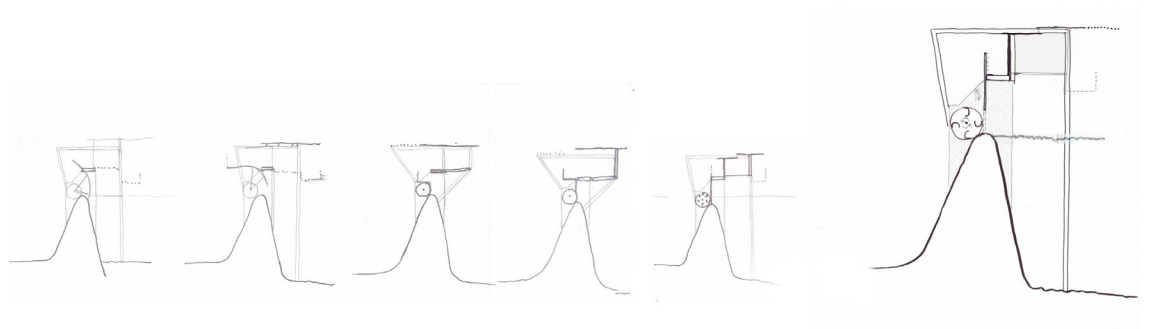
Longitudinal section West to East (Author, June 2016).
